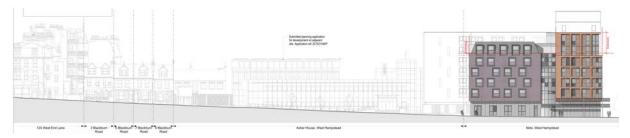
Proposed contextual long south elevation along Blackburn Road (Not to Scale)
